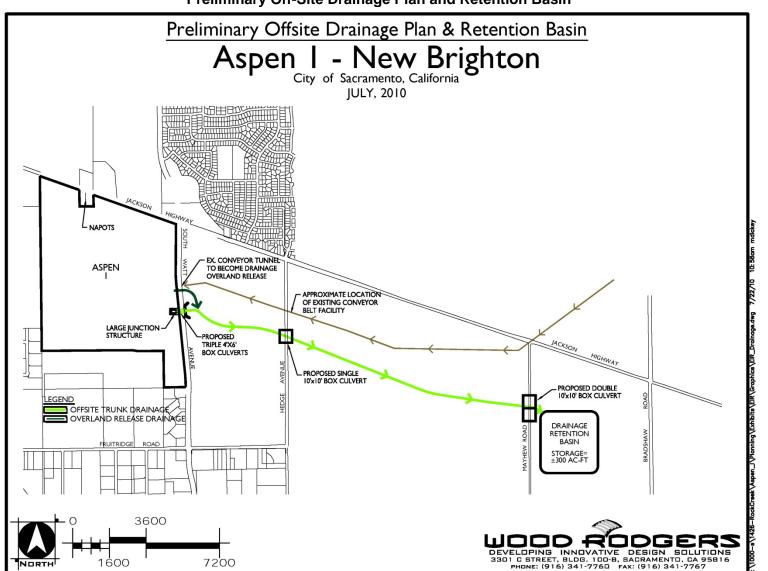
Preliminary Off-Site Drainage Plan and Retention Basin
